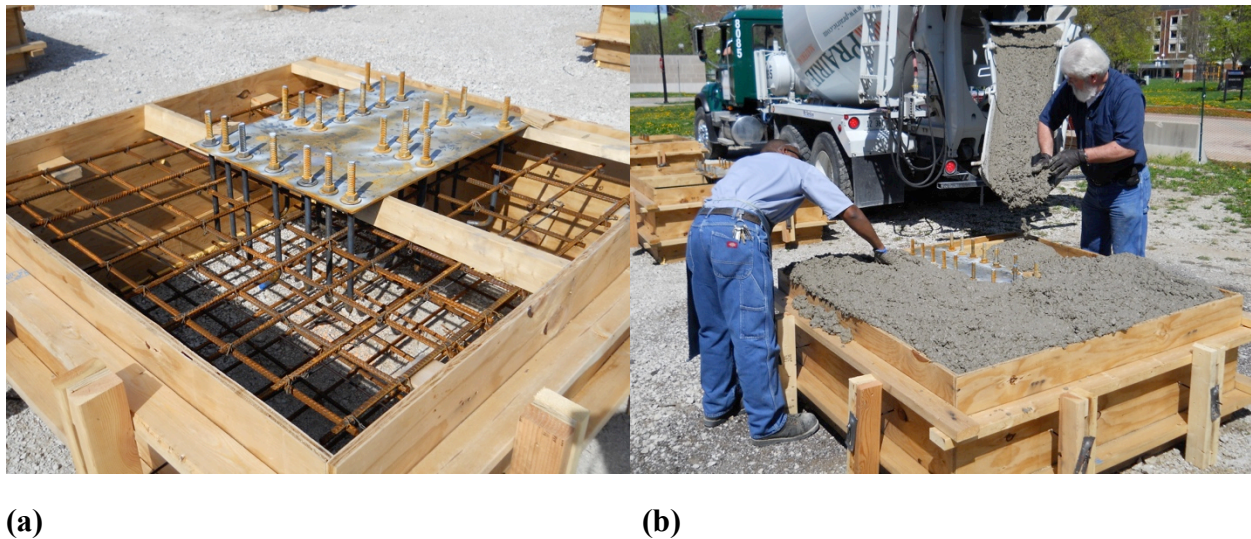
(a) Footing Form with Reinforcing, Column Anchor Rods and Setting Plate Installed (b) Placing Concrete Footings
